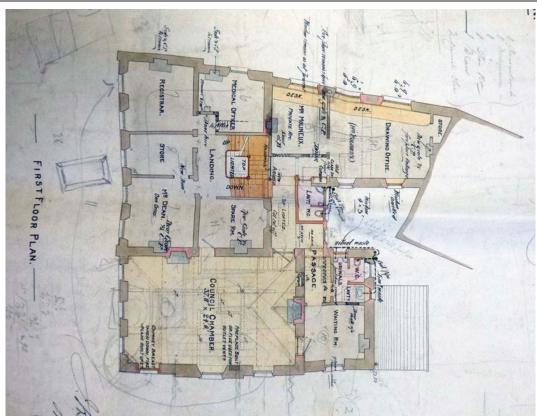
First floor plan of proposed council offices, dated 1902 (CAC(B) Z/1028/2 1901-1904)
